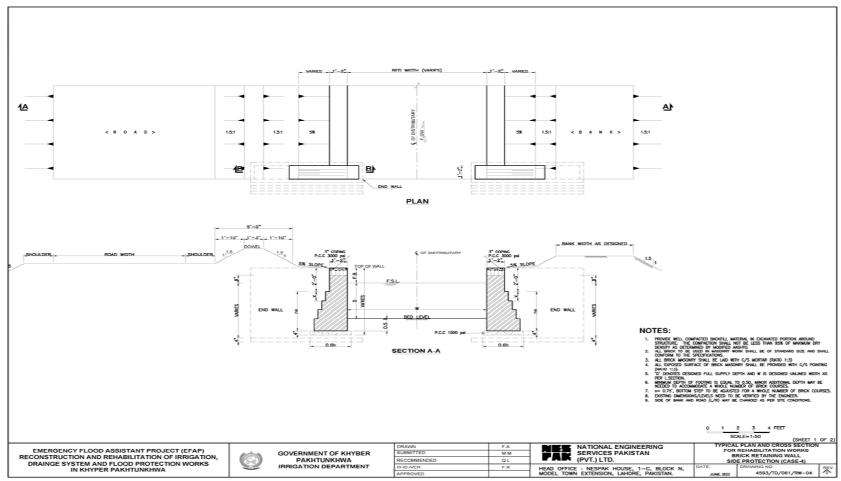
Typical Cross section for Rehabilitation work Brick Retaining Wall
